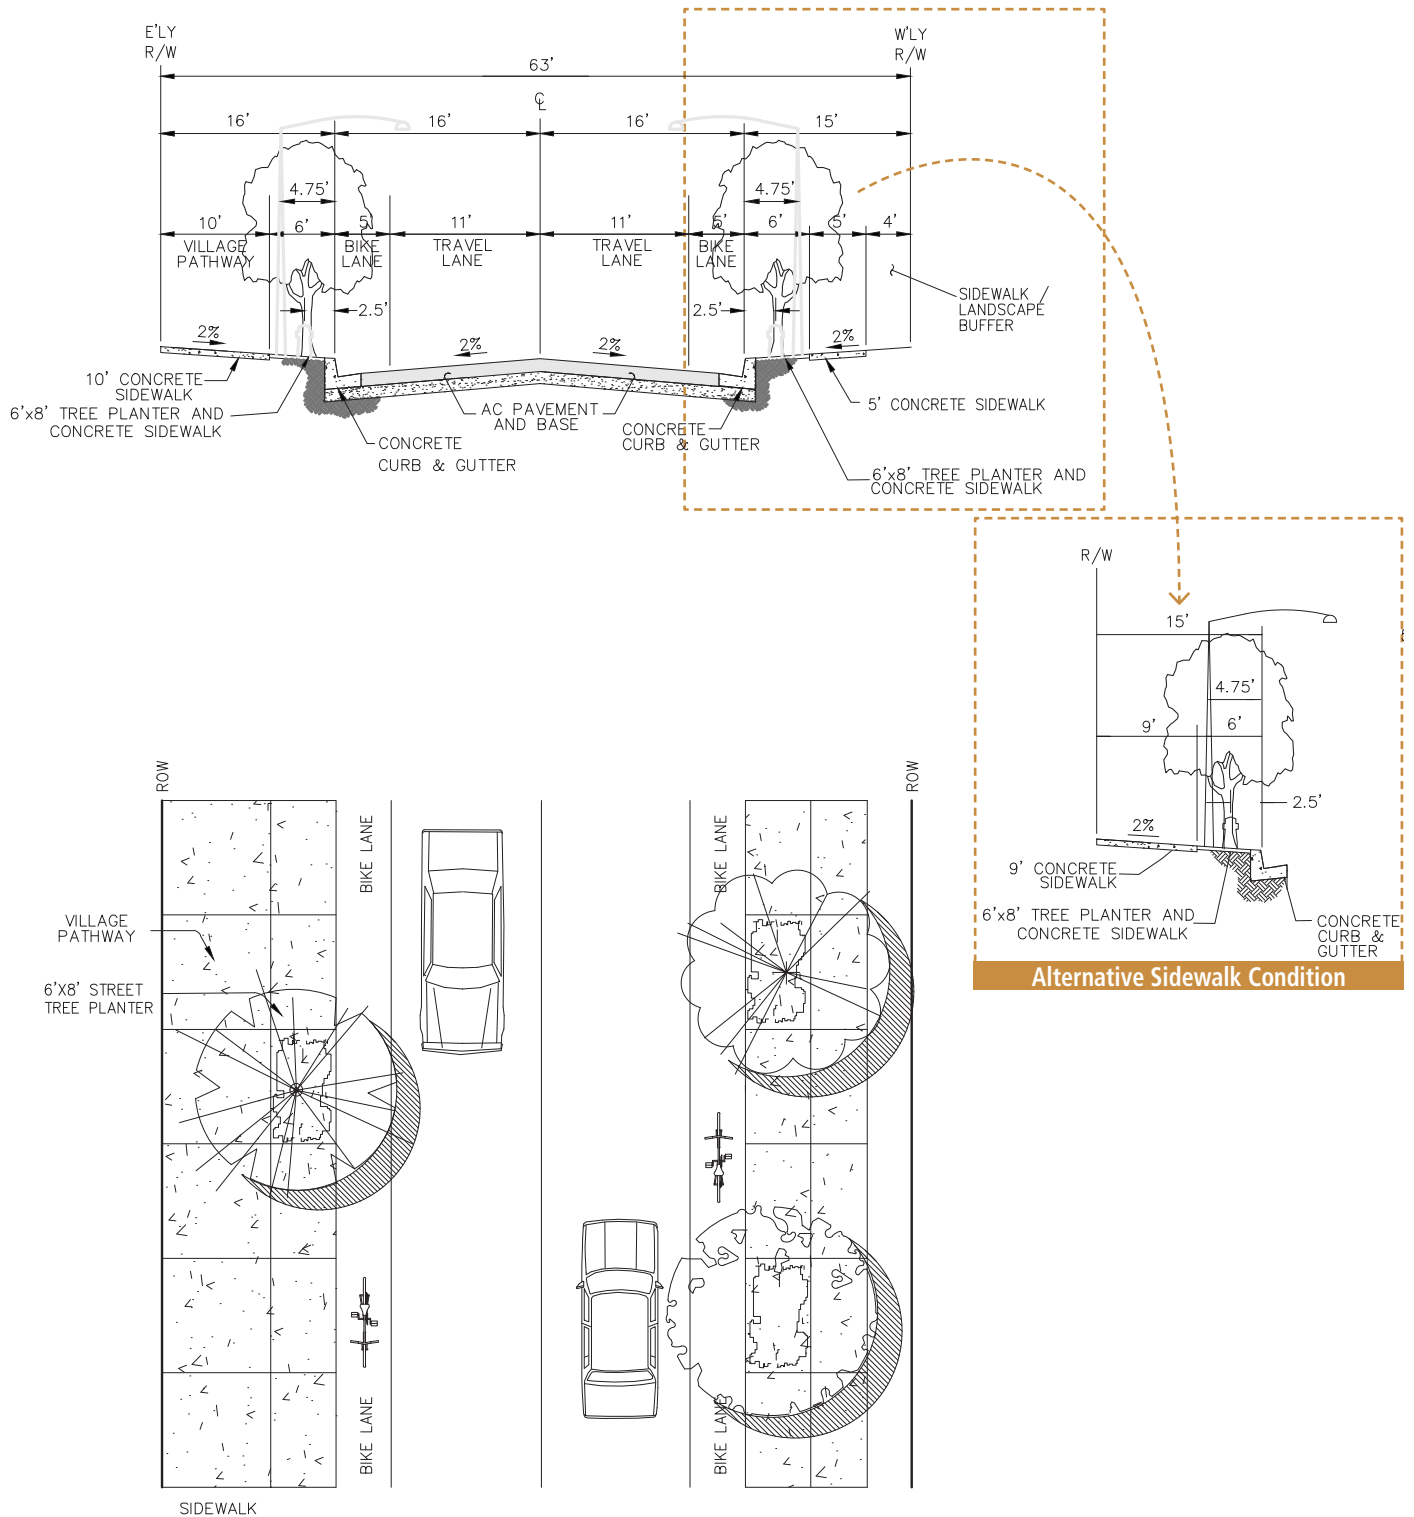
Avenida Caprise (Between Eastbound and Westbound Main Street) (TM Street Section 5)
